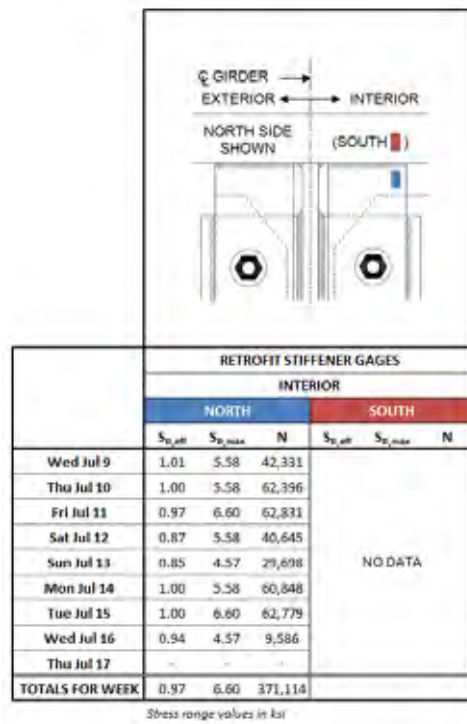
Stress Range Summary for Gages Near Connection of Floor Beam 16 to Girder 2
